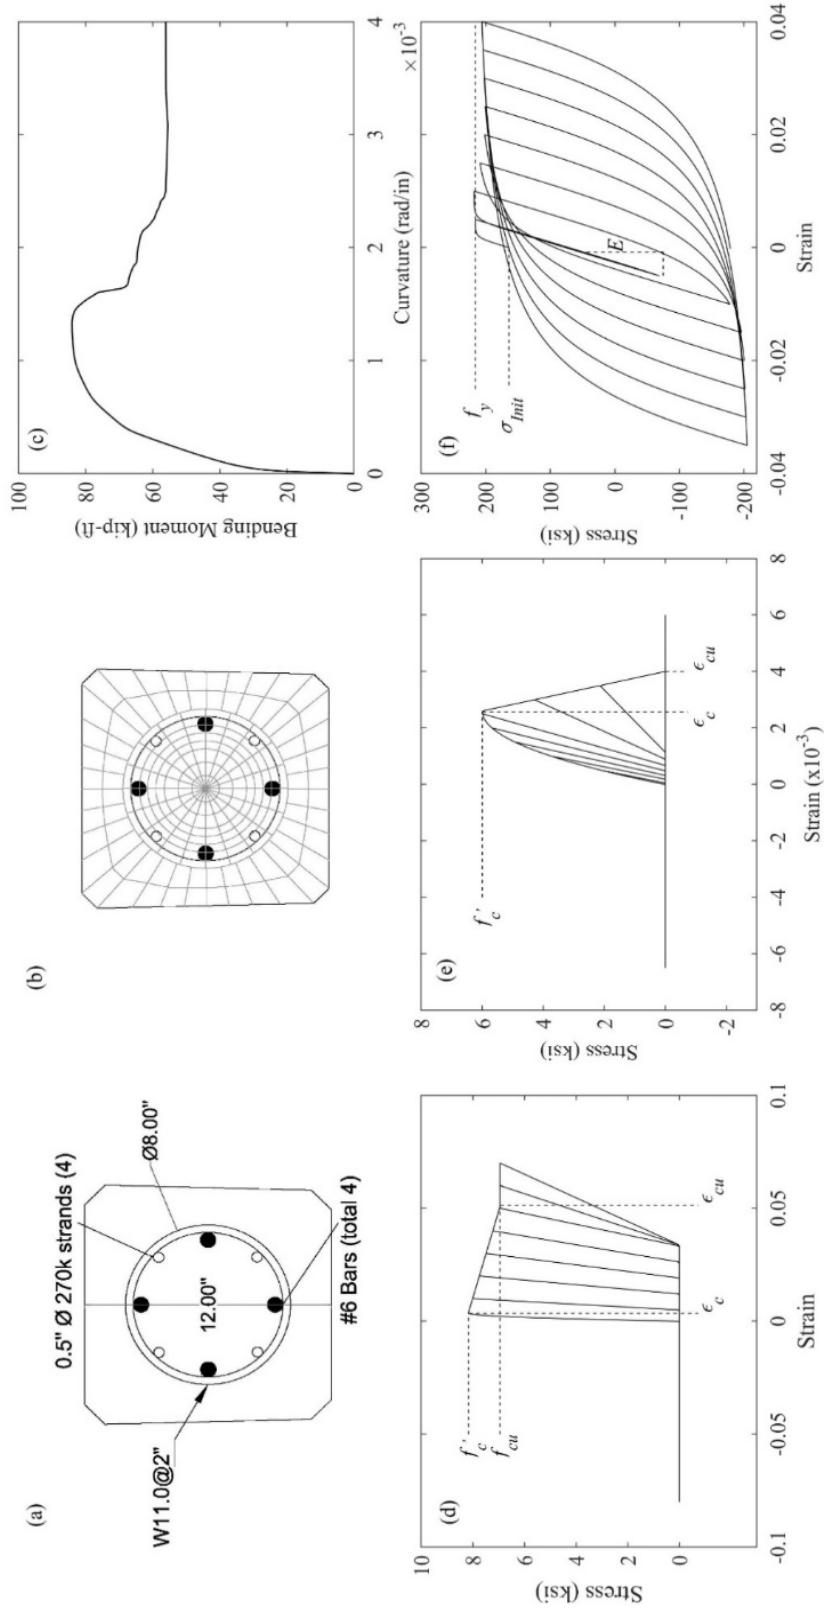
Prestressed reinforced concrete pile modeling using fiber section beam-column element with uniaxial material constitutive models: (a) pile geometry section; (b) fiber discretization of pile cross section; (c) Moment-curvature response of prestressed reinforced concrete pile cross section, (d) and (e) Core and cover Concrete01 Kent-Scott-Park model with degraded linear unloading/reloading stiffness; (f) Steel02 Giuffre-Menegotto- Pinto model with isotropic strain hardening and an axial initial stress (negative represents compressive axial force; positive represents tensile axial force).
